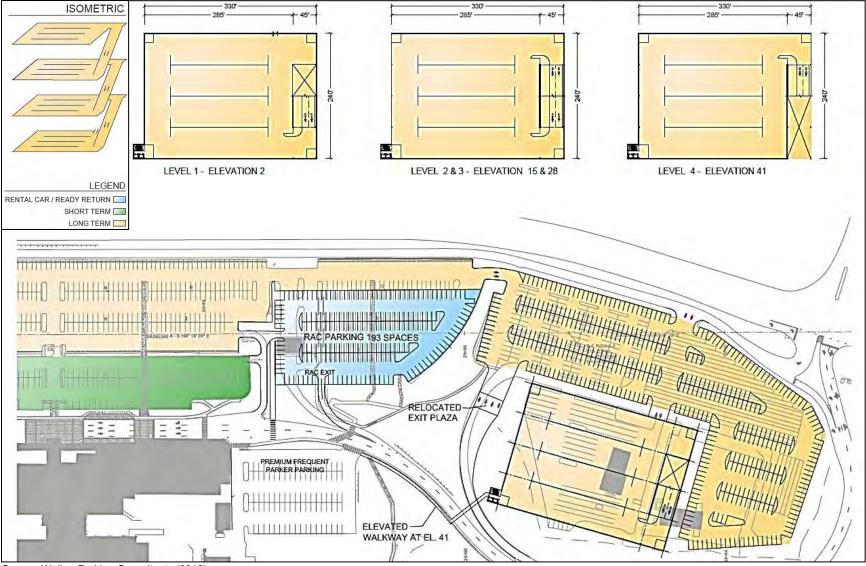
Alternative 24 – Parking Garage at Site 5
